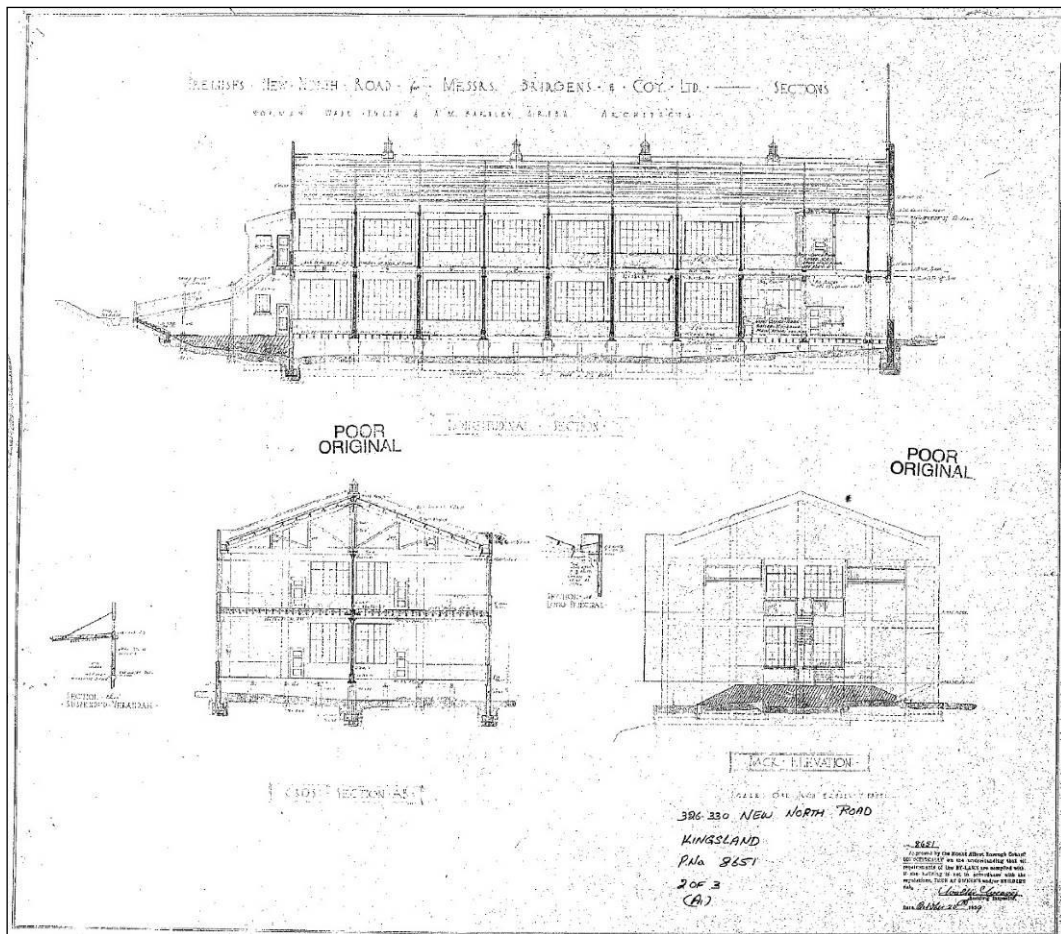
1929 Drawings for 'Premises New North Road for Messrs Bridgens and Coy Ltd' - by Wade and Bartley Architects: Sections and Rear Elevation. Auckland Council Filenet. Accessed October 2016.
